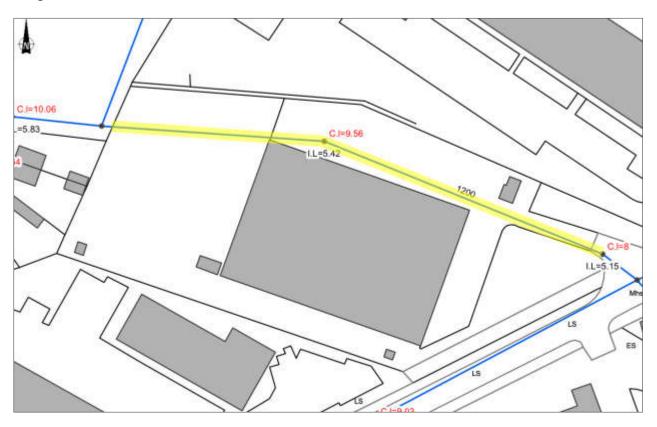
Existing stormwater drainage surrounding the site (extract from Council records) (from Punch Consulting Engineers, 2022).
